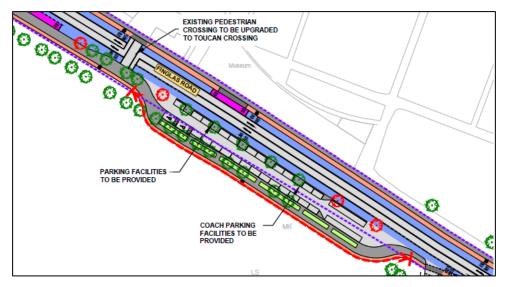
Proposed Larger Car Park on Finglas Road at Glasnevin Cemetery
